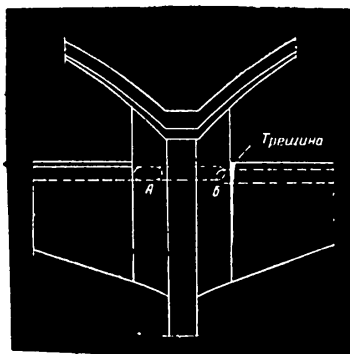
Crack in a Perederiy tie beam-column joint
